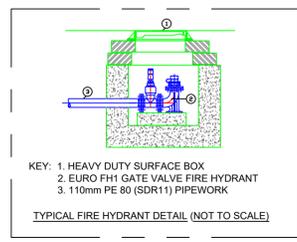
SMK-ZZ-L0-DR-M-5001
